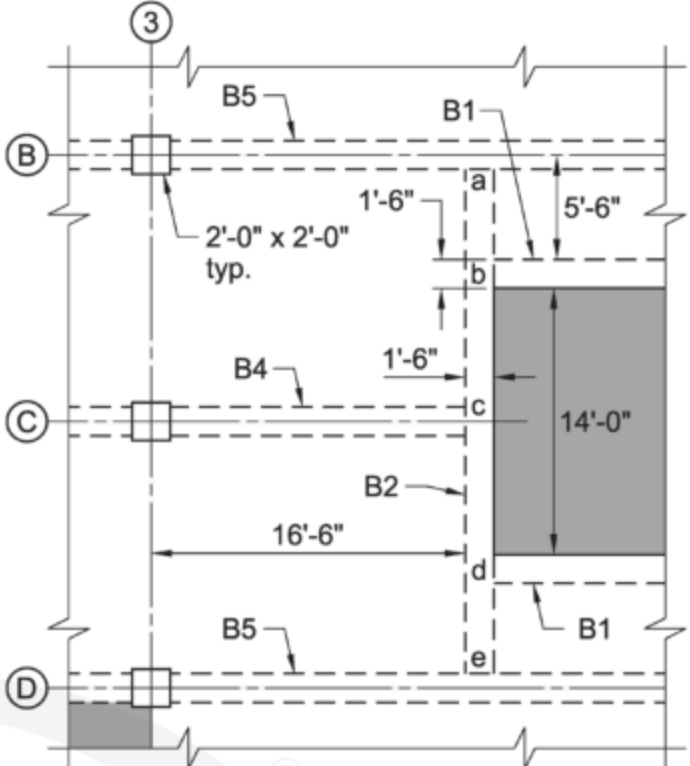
Framing plan showing slab opening and beams framing slab opening.
